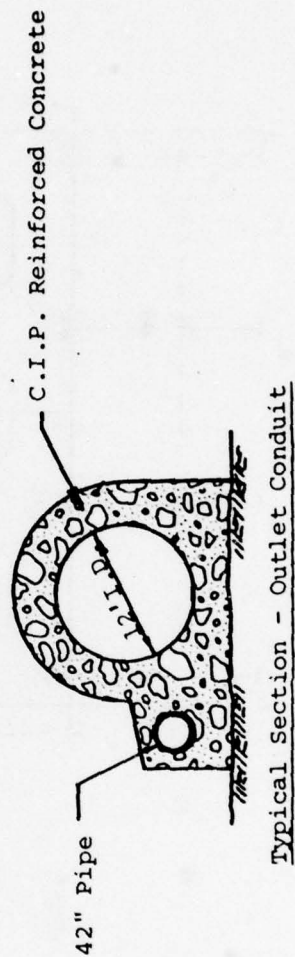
OUTLET WORKS, DEQUEEN LAKE DAM
